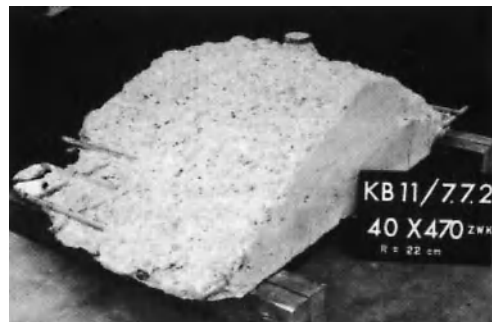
Concrete failure cone of a large headed stud located near the edge and loaded in concentric tension (Forschungs- und Materialprüfungsanstalt Baden-Württemberg (1985/1))
